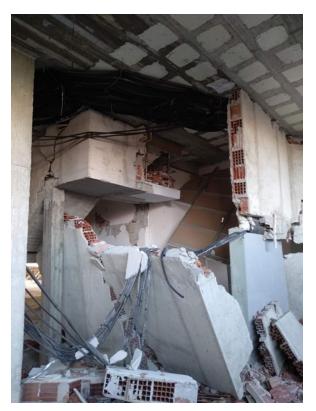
Masonry infill debris damaged the building's electrical and piping infrastructure (source: Nikolić-Brzev et al., 2020).
